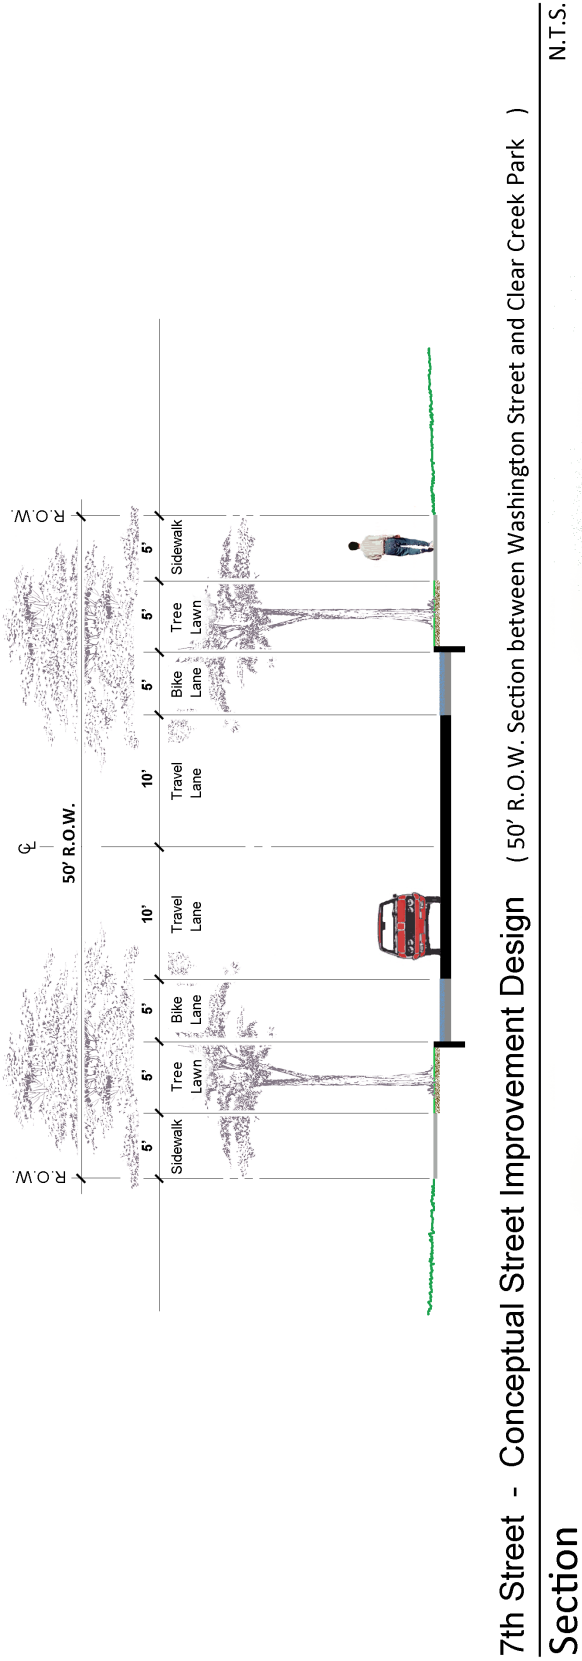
CONCEPTUAL STREET IMPROVEMENT DESIGN (7th STREET AND BURKS BRANCH ROAD, WASHINGTON STREET TO CLEAR CREEK PARK)
